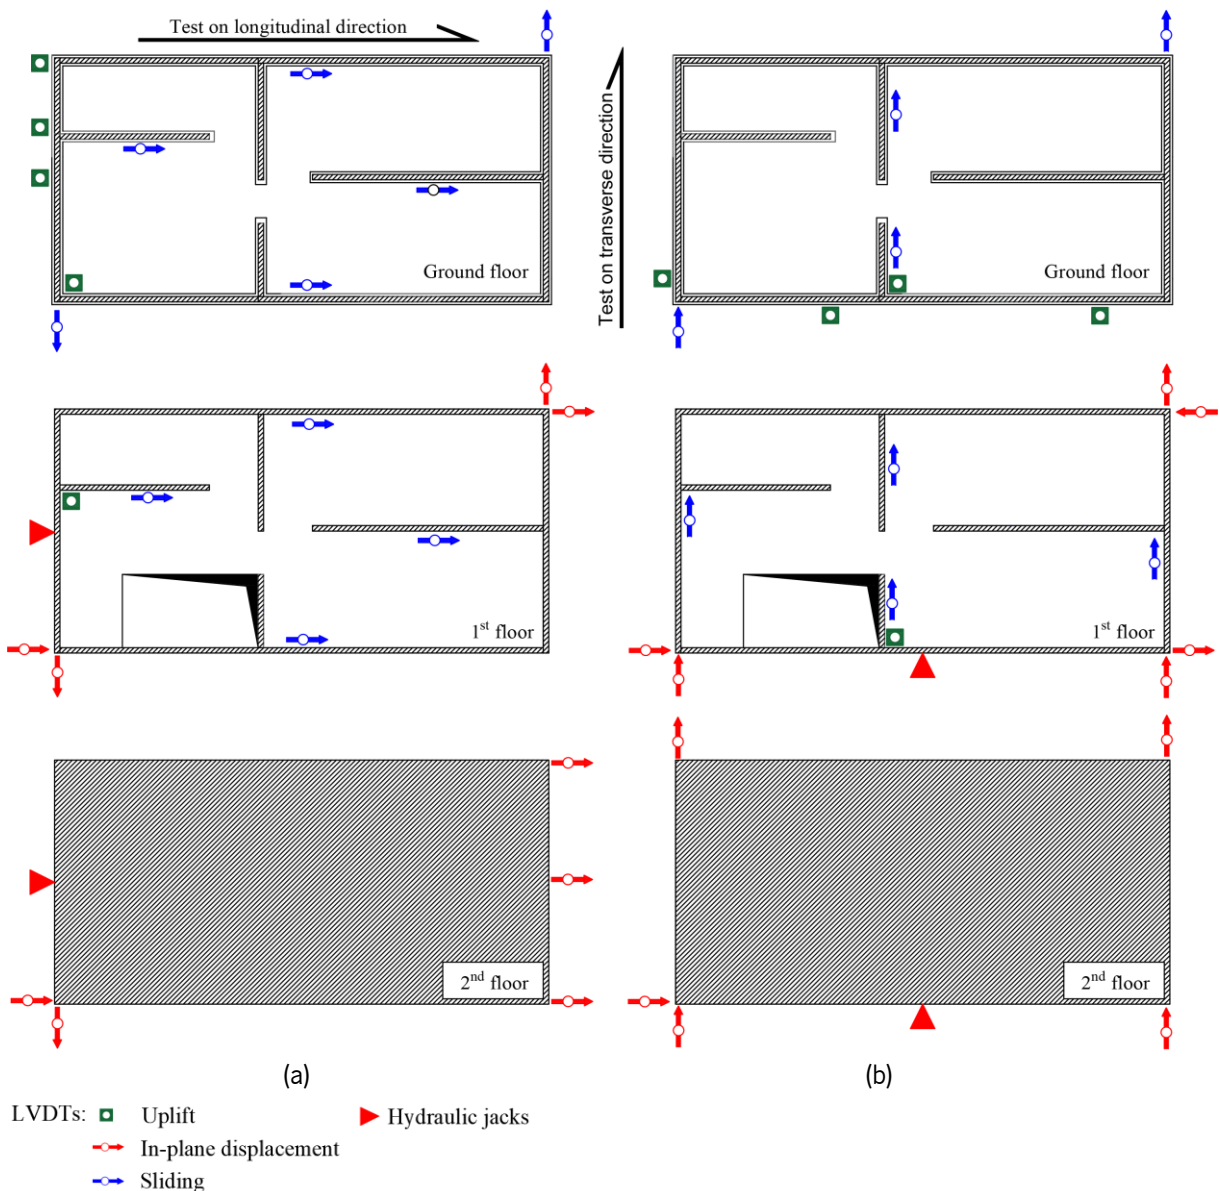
Instrumentation used in the tests in longitudinal (a) and transverse (b) direction.
